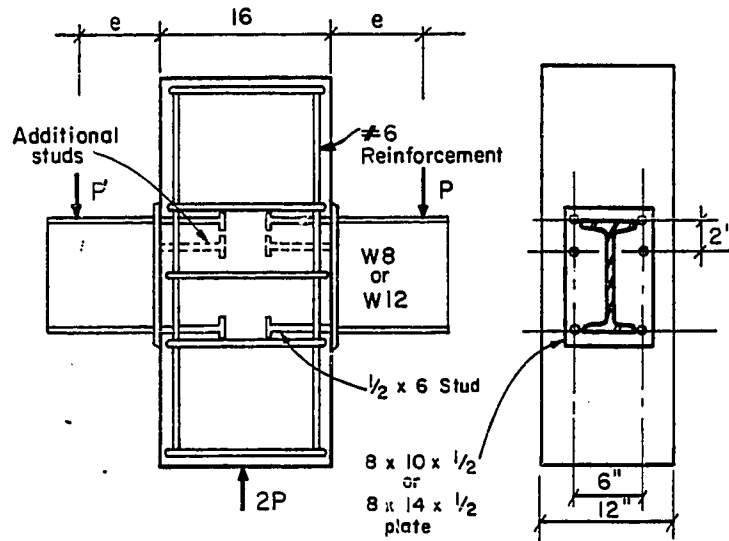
Typical specimen used by Hawkins and Roeder (Ref. 19).
